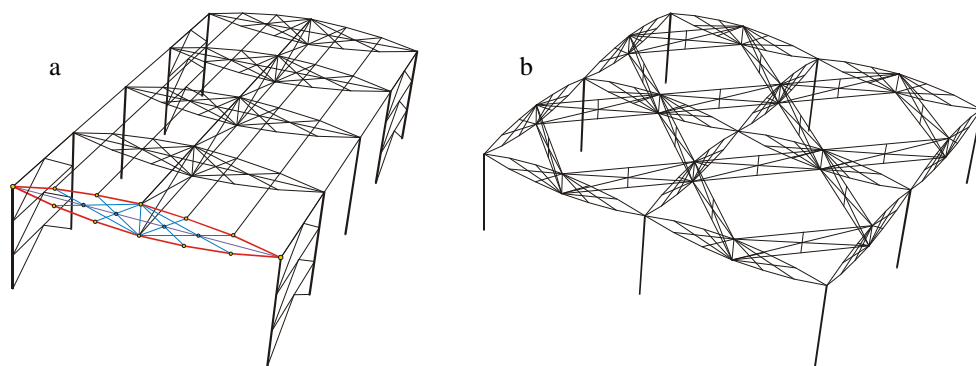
a) Scheme of a typical hall system, b) example of more complex form of the roof hall structure designed by means of simple form of the lenticular girder
